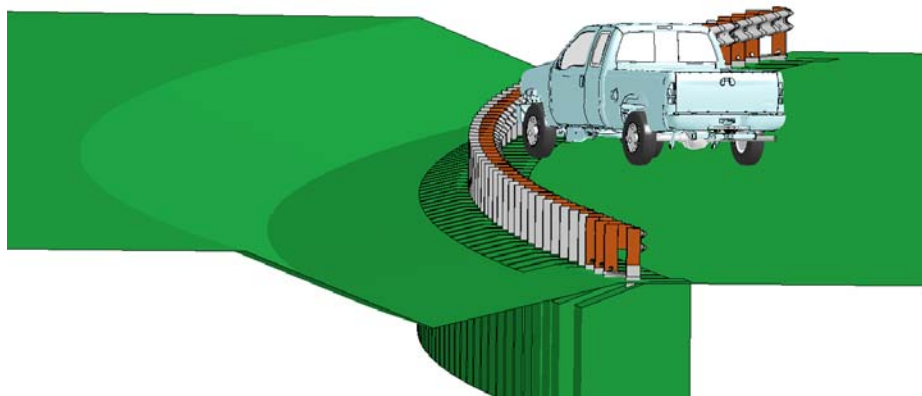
FE model of a front-side impact on a single-faced W-beam guardrail with concave horizontal curvature placed on a 4H:1V slope and impacted by a Ford F250.
